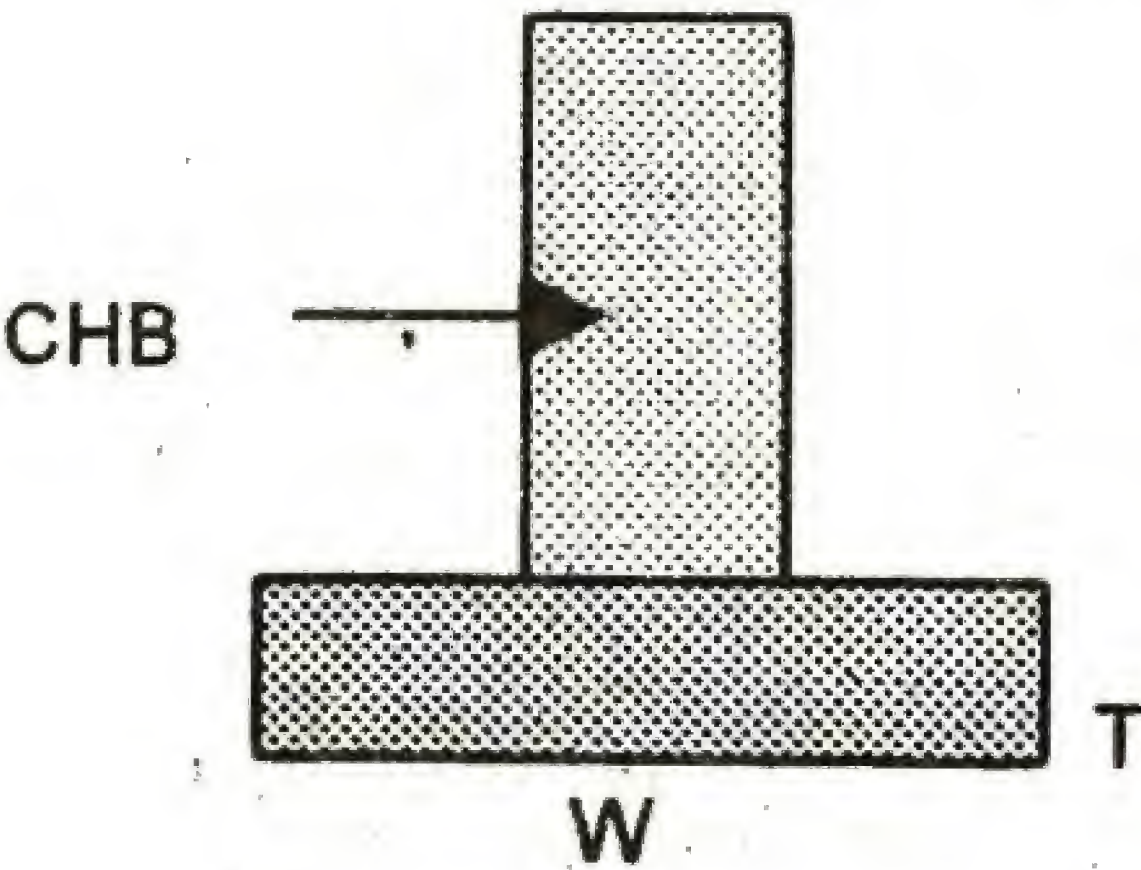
CROSS SECTION OF CHB FOOTING
